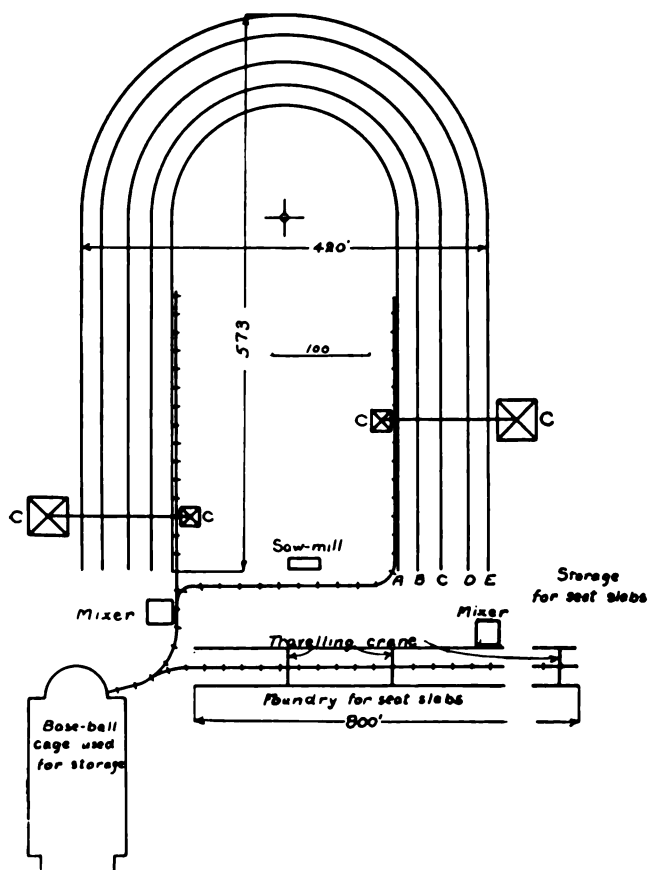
GENERAL PLAN OF CONSTRUCTION PLANT.
